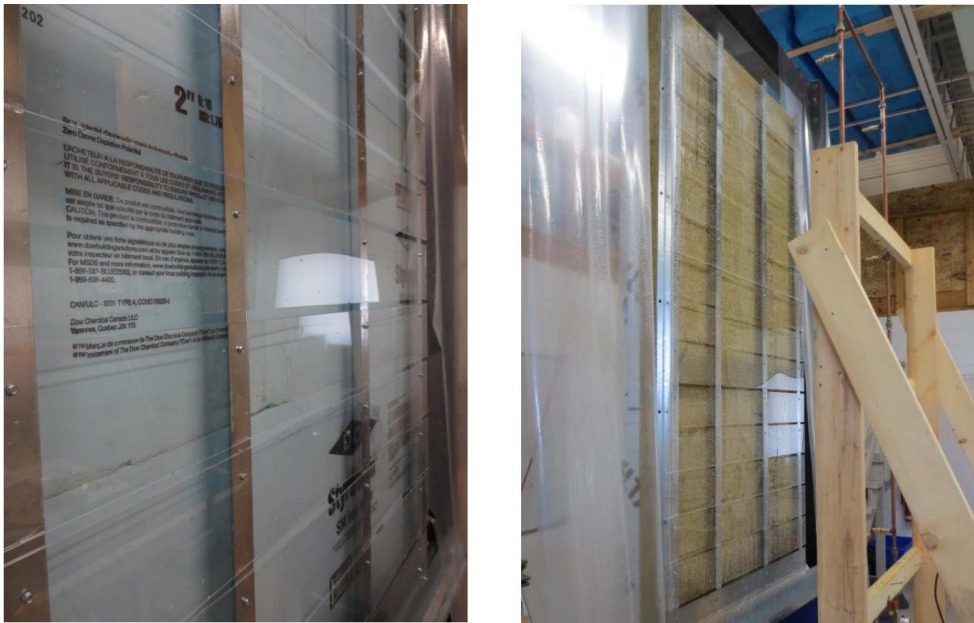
Open-jointed cladding installed over both an XPS and ROCKWOOL® stone wool wall assembly.
